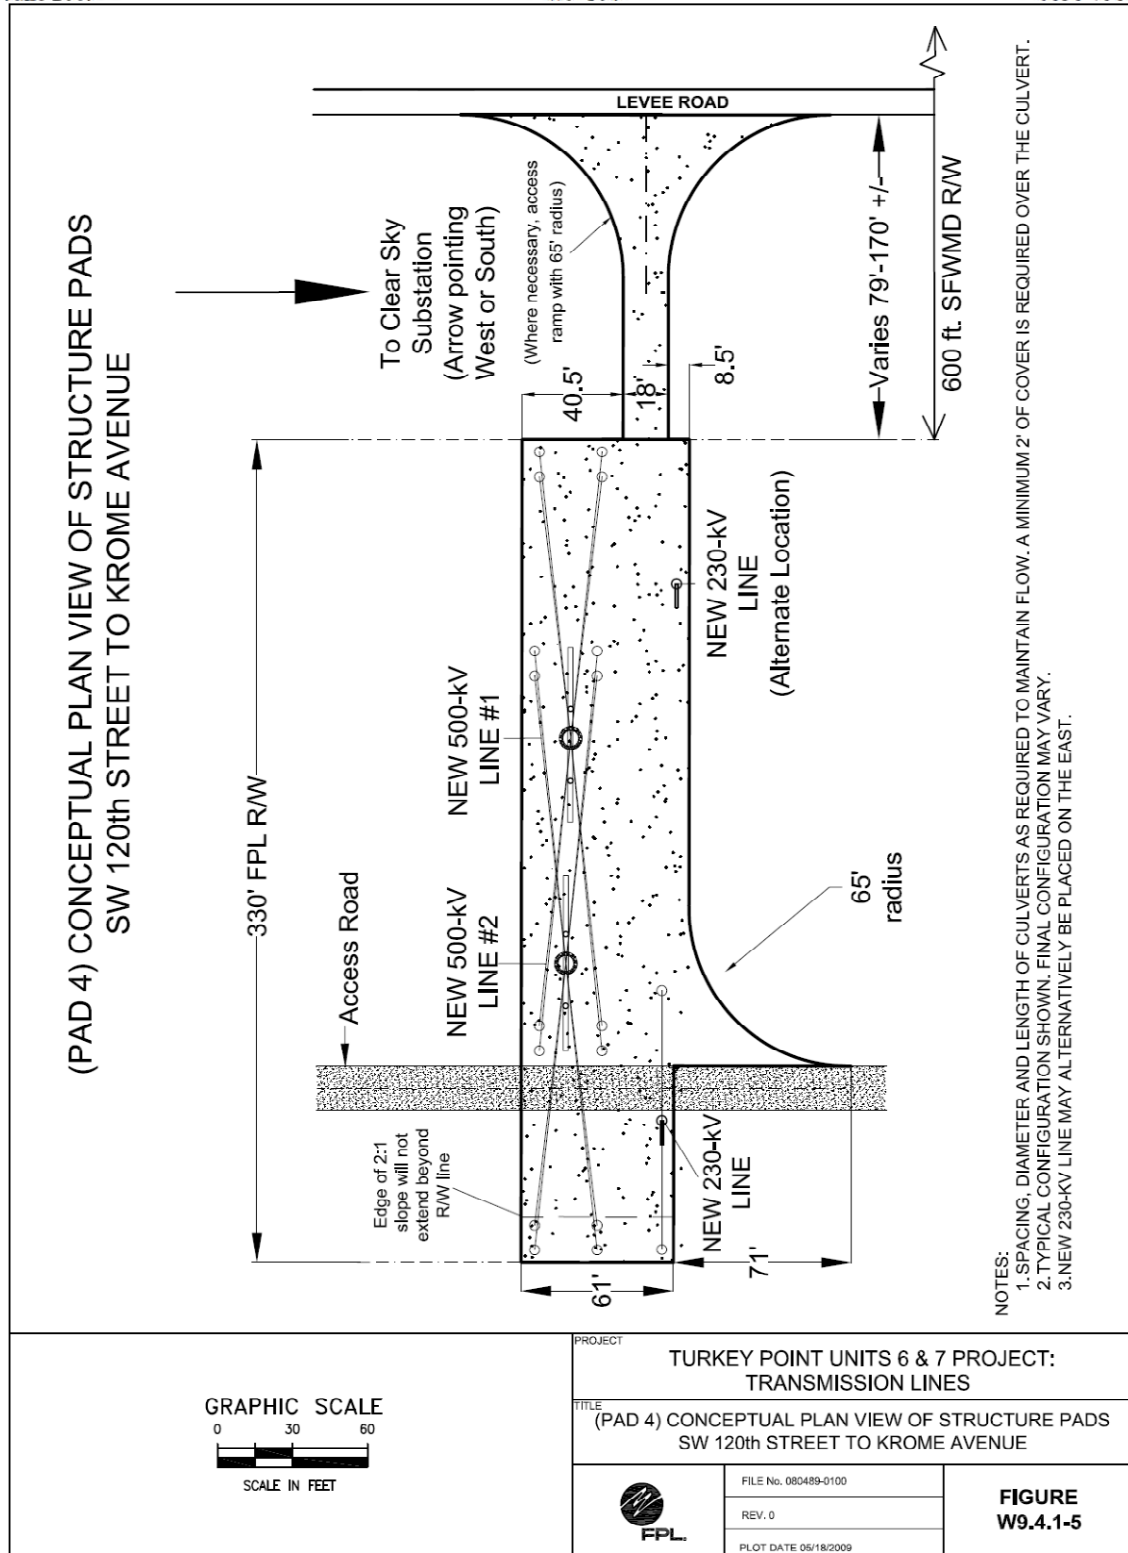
(PAD 4) CONCEPTUAL PLAN VIEW OF STRUCTURE PADS SW 120TH STREET TO KROME AVENUE
